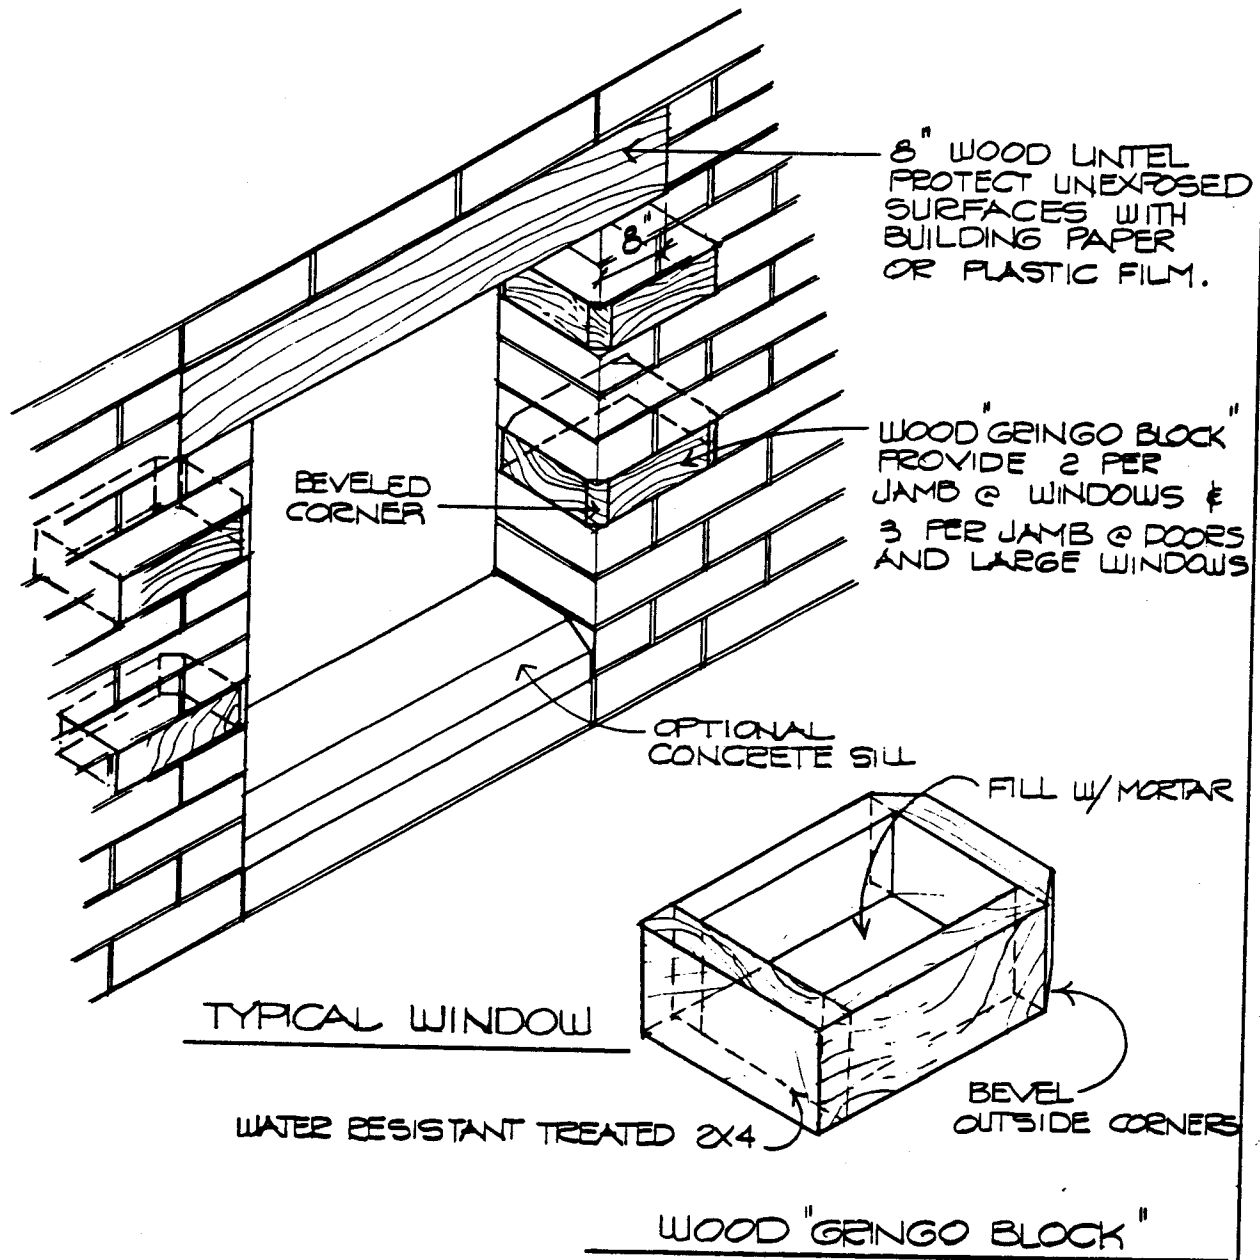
WOOD "GRINGO" BLOCKING DETAIL.
